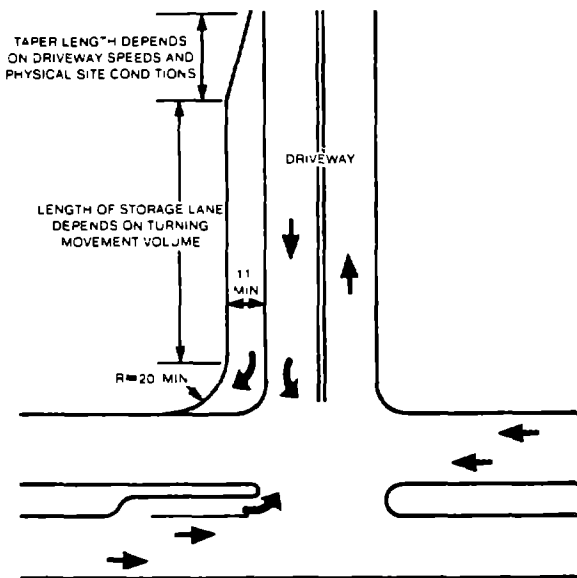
INSTALLATION OF ADDITIONAL EXIT LANE ON DRIVEWAY
